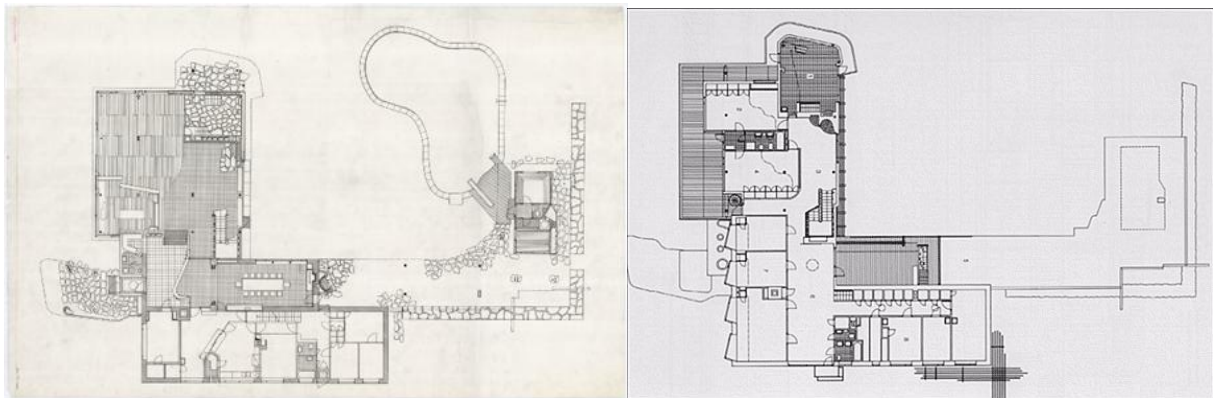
A photograph showing the ground floor and first floor plans of Villa Mairea.
